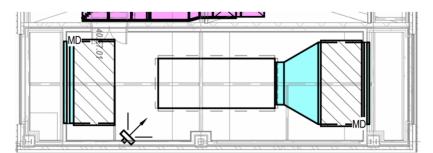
Generator room intake and exhaust silencers indicated on drawings.
